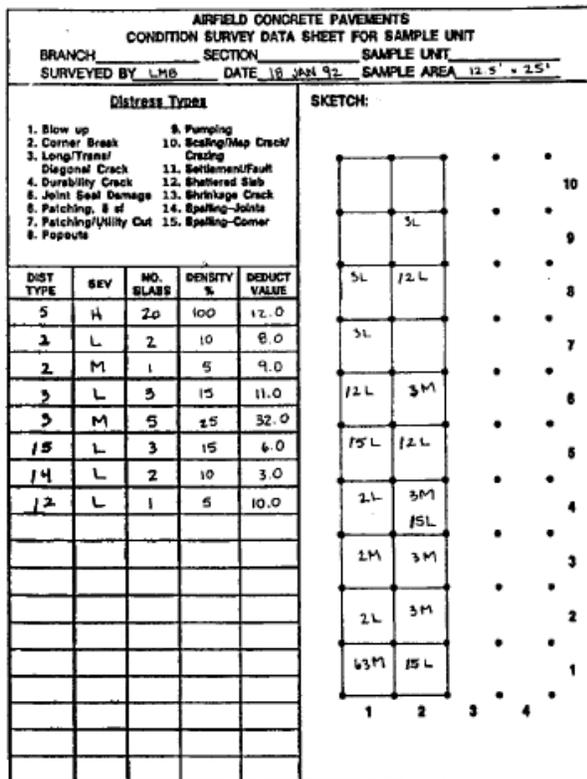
Example of a Jointed Rigid Pavement Condition Survey Data Sheet
